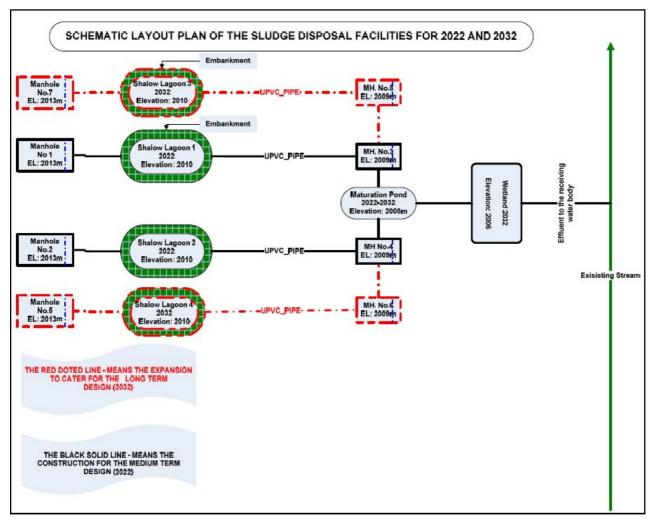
Schematic layout drawing of the proposed sludge disposal facility
